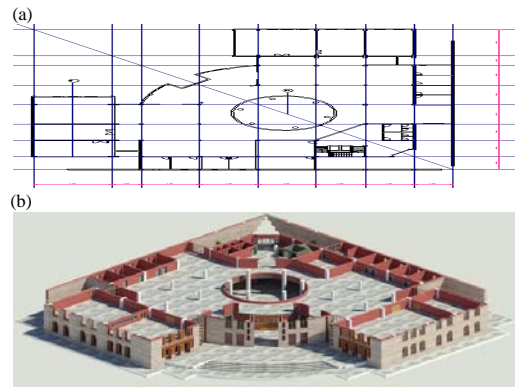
a, b) Plans (2 and 3D) of the first floor of case study using BIM
